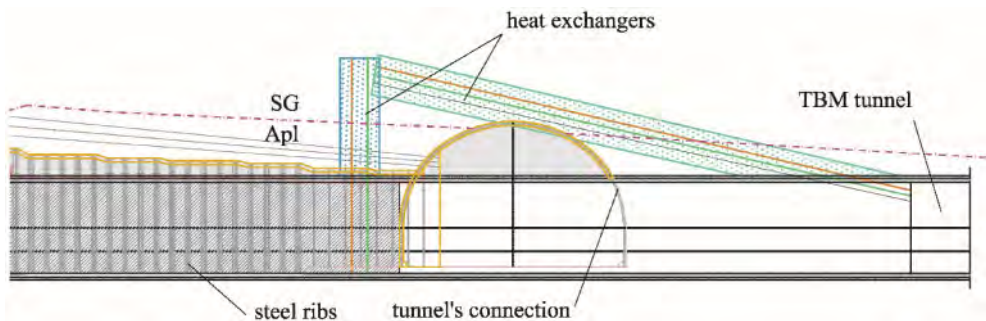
Longitudinal section of the artificial ground freezing for the connection between two tracks.
